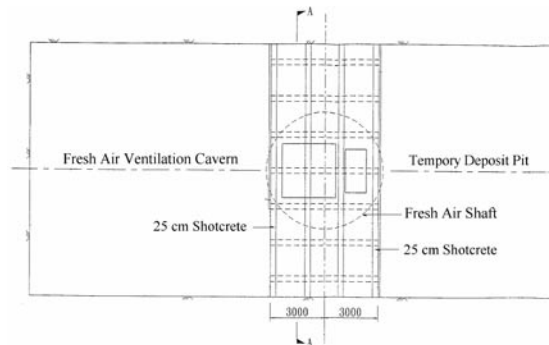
The Plane of Deck Platform in the Fresh Air Ventilation Cavern
